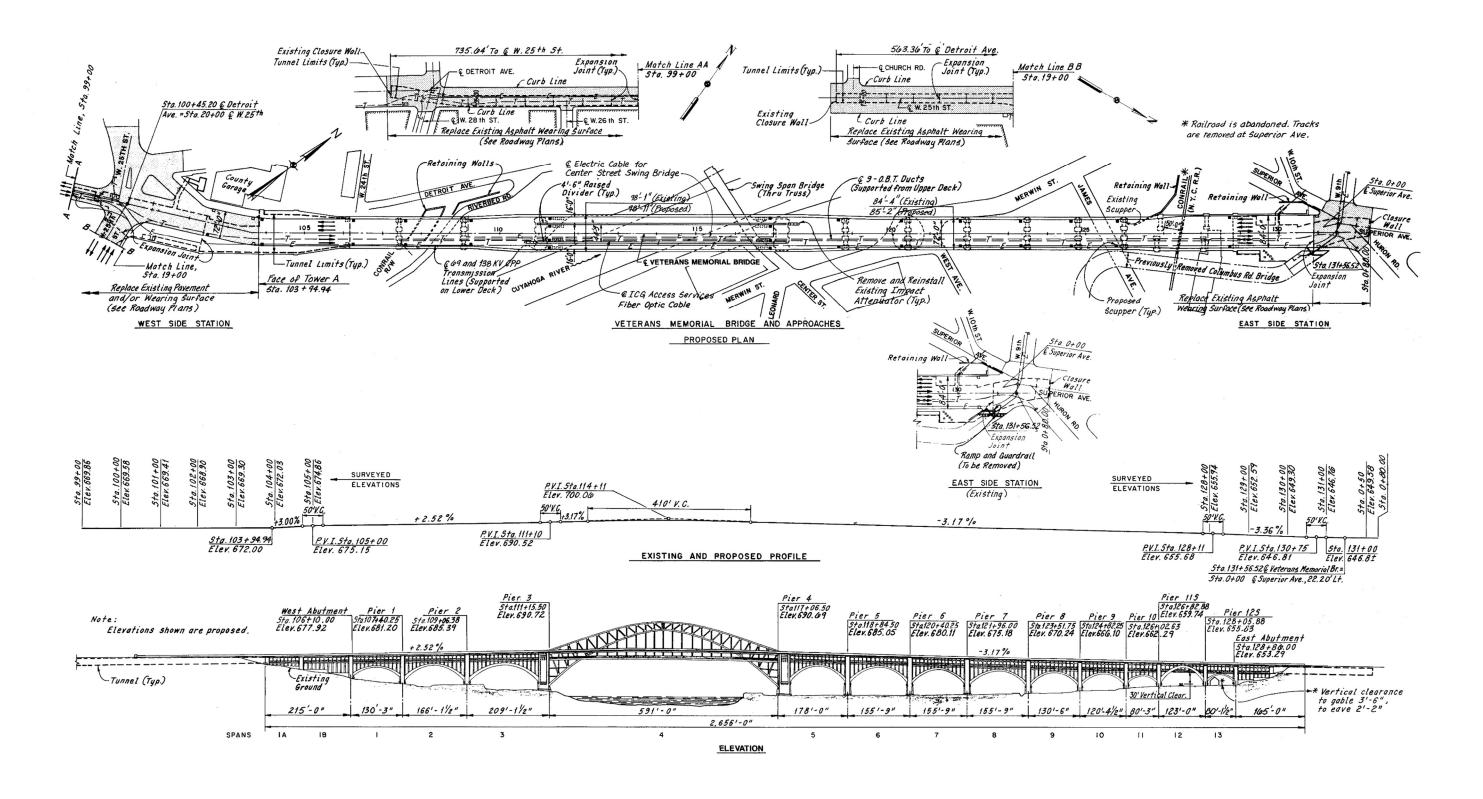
CUY-6-1456 Plan & Elevation (Veterans Memorial Bridge Rehabilitation Plans, 1994).
